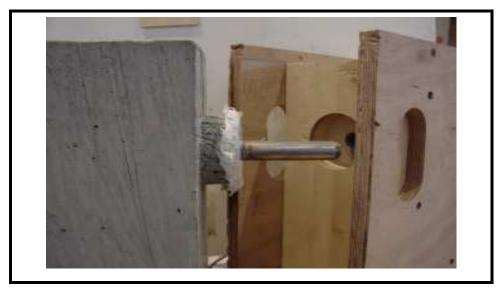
Timber with concrete connection is made with a 20 mm steel dowel (Kuilen, J-W.G., document on-line).
